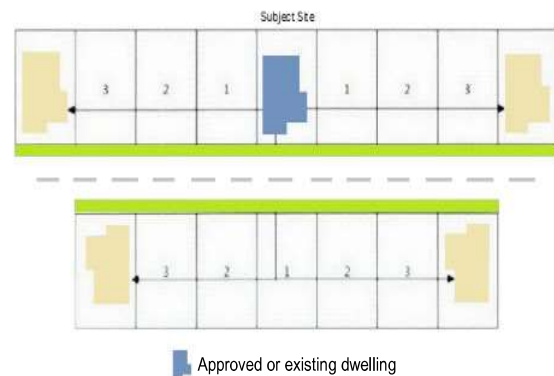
Illustration showing location of lots which must not have the same front facade design as an approved or existing dwelling
